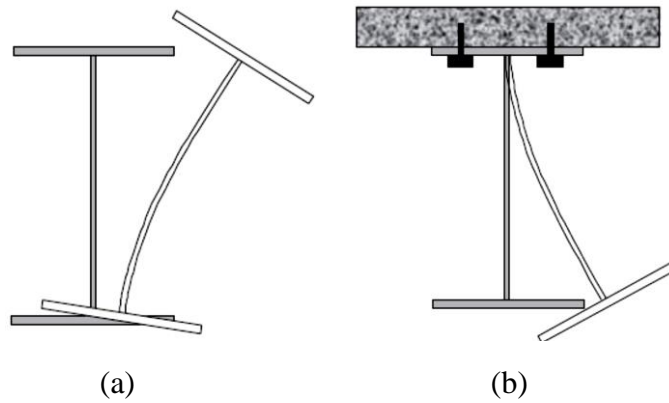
Steel I-girder (a) LDB (positive bending) and (b) RDB (negative bending)
